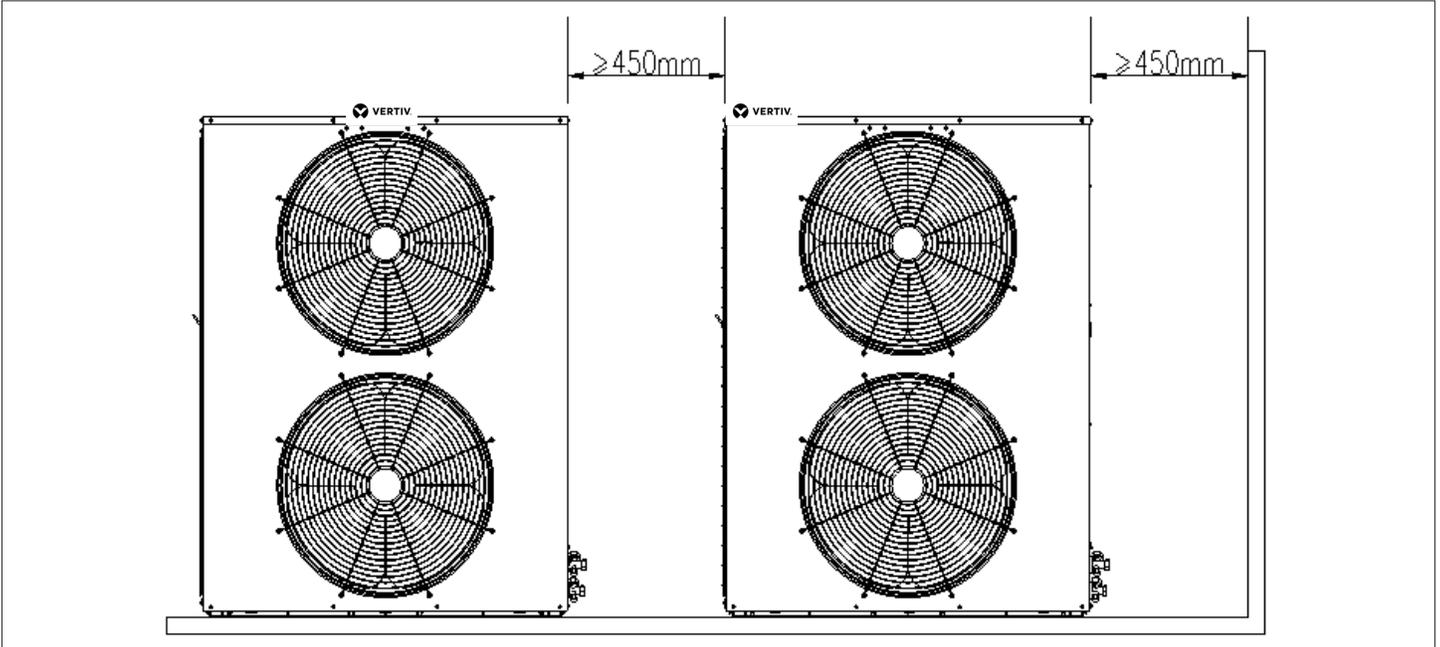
Horizontal Installation of Multiple Outdoor Units
